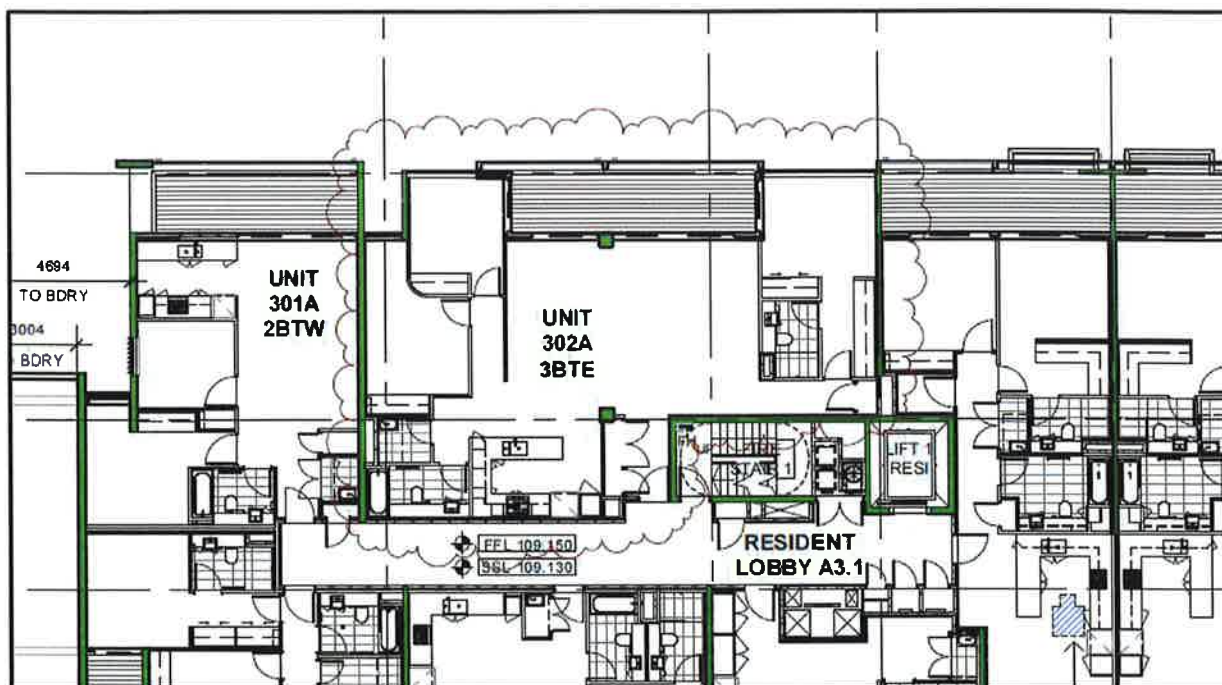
Proposed floor plan showing subject apartments, including balconies being amalgamated into one three bedroom apartment (Source: Applicant's submitted plans)
